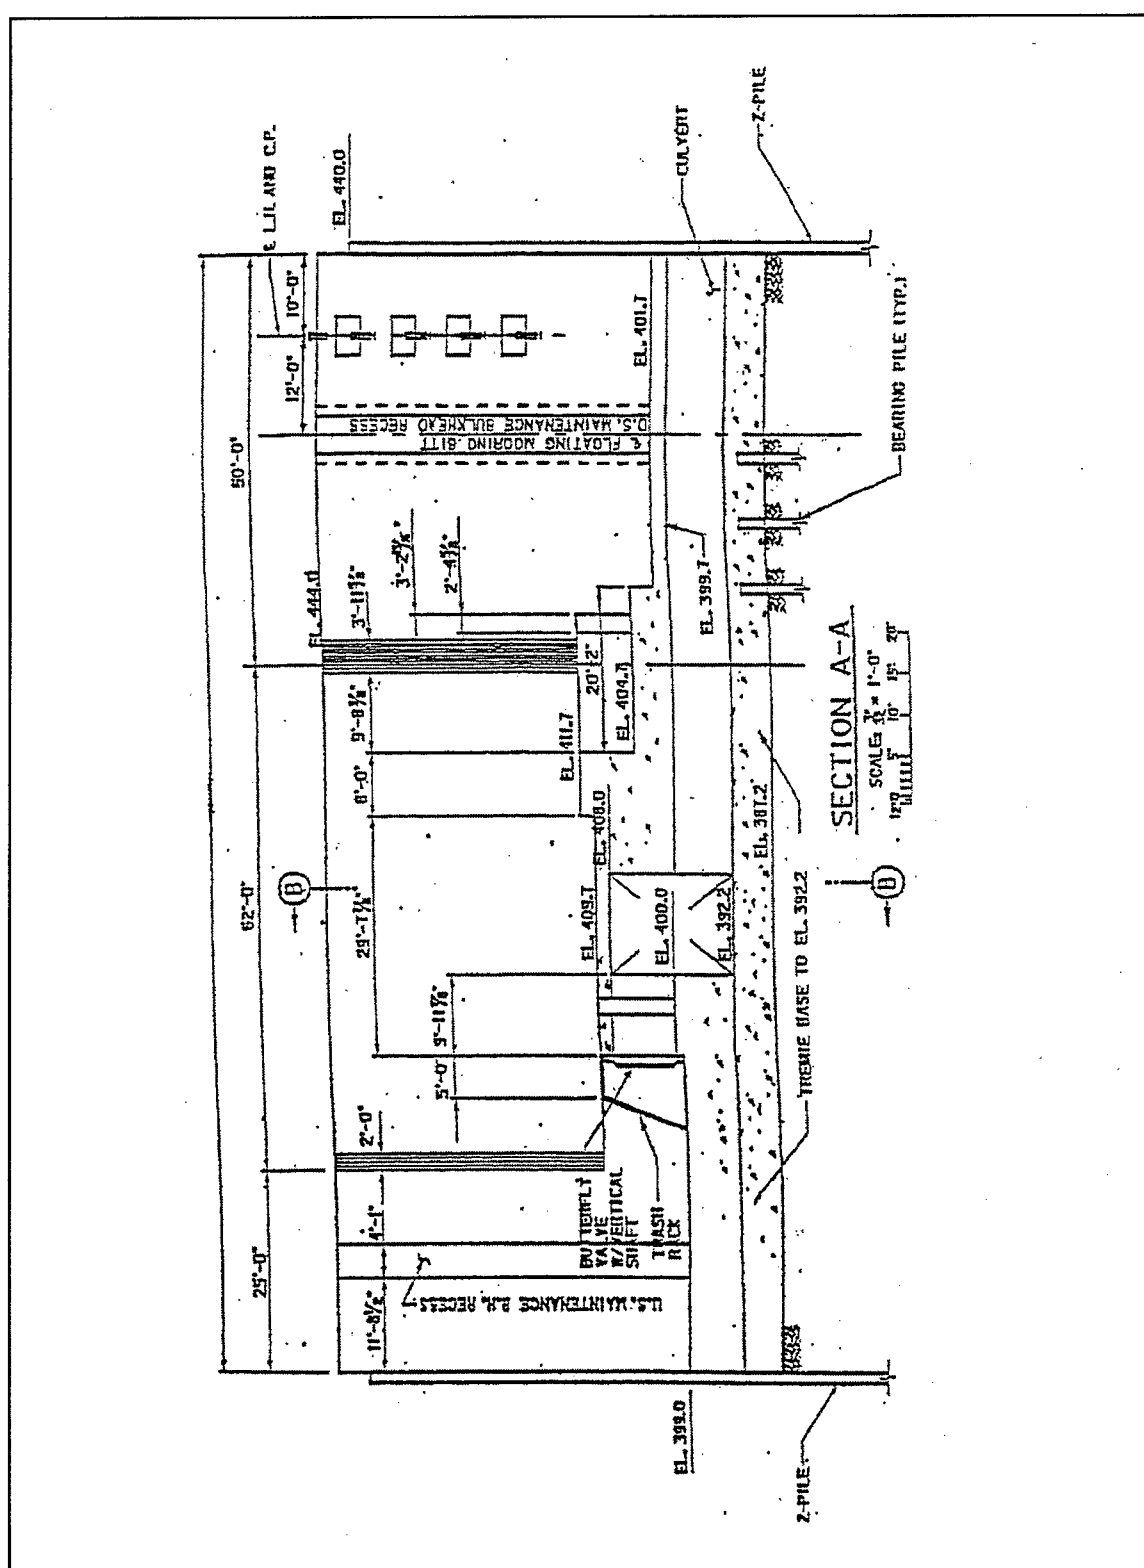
Plan 4, section through miter gate sill with filling and emptying valves
